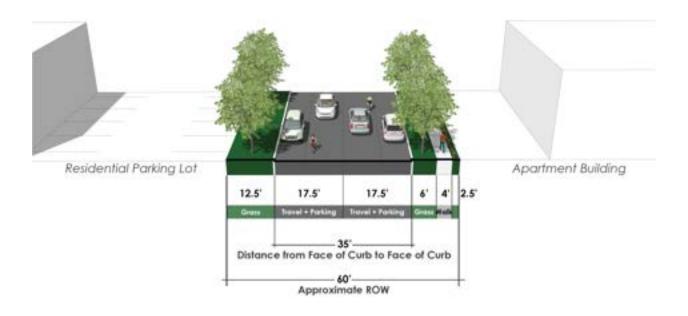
Keokee Street – Existing Cross-Section (Looking North)
